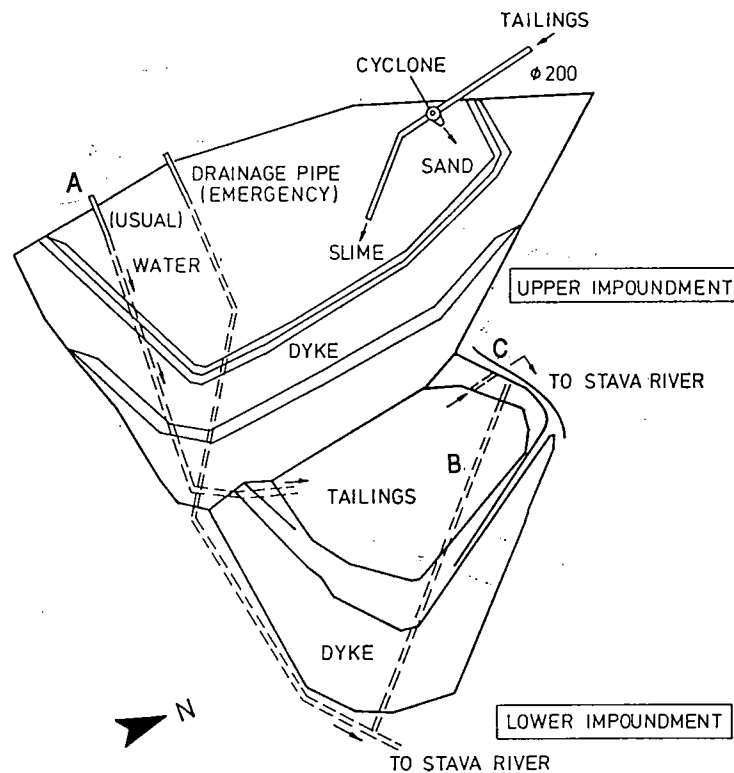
Plan View of the Prestaval Tailings Dams (from Berti, et al., 1988)
